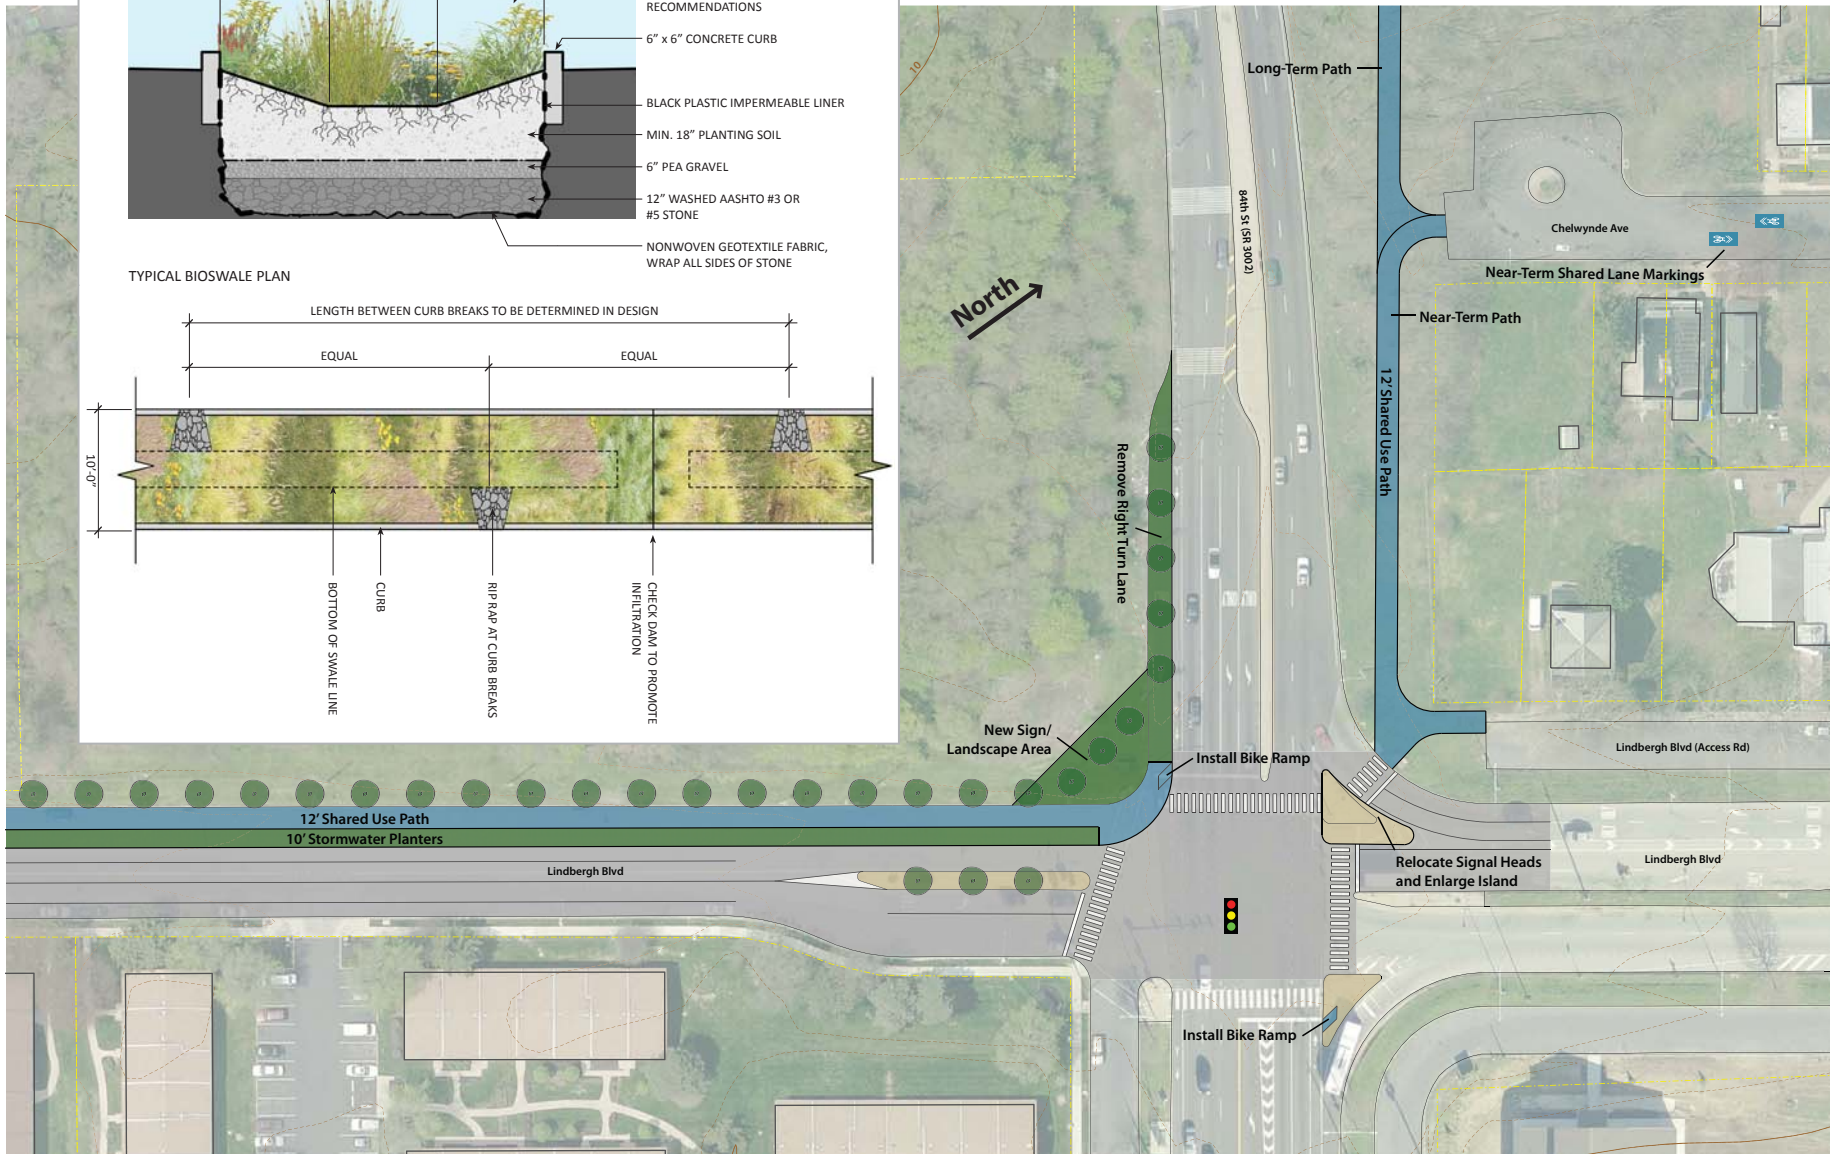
84th Street/Lindbergh Boulevard Intersection
